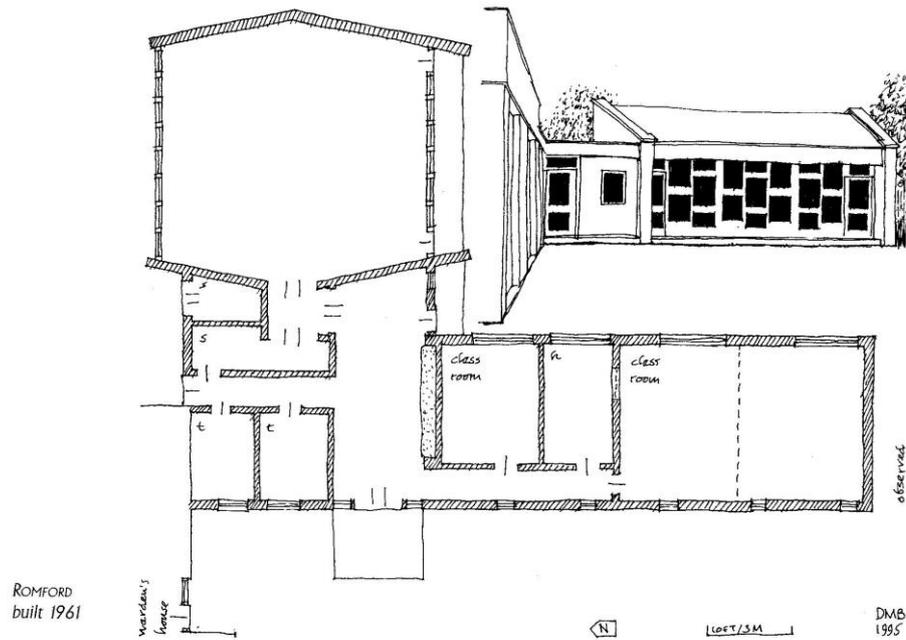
The ground plan and perspective view of the building from *Butler* vol 1 p.196
